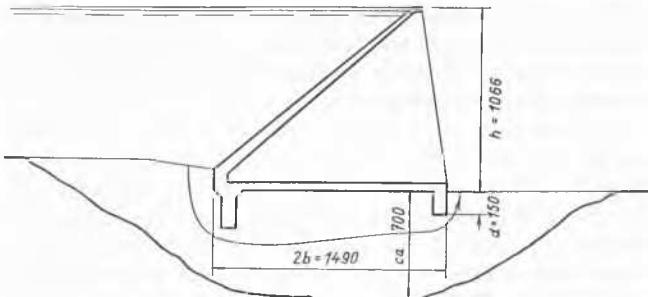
Piping Under the Ashley Weir—Dimensions in mm
